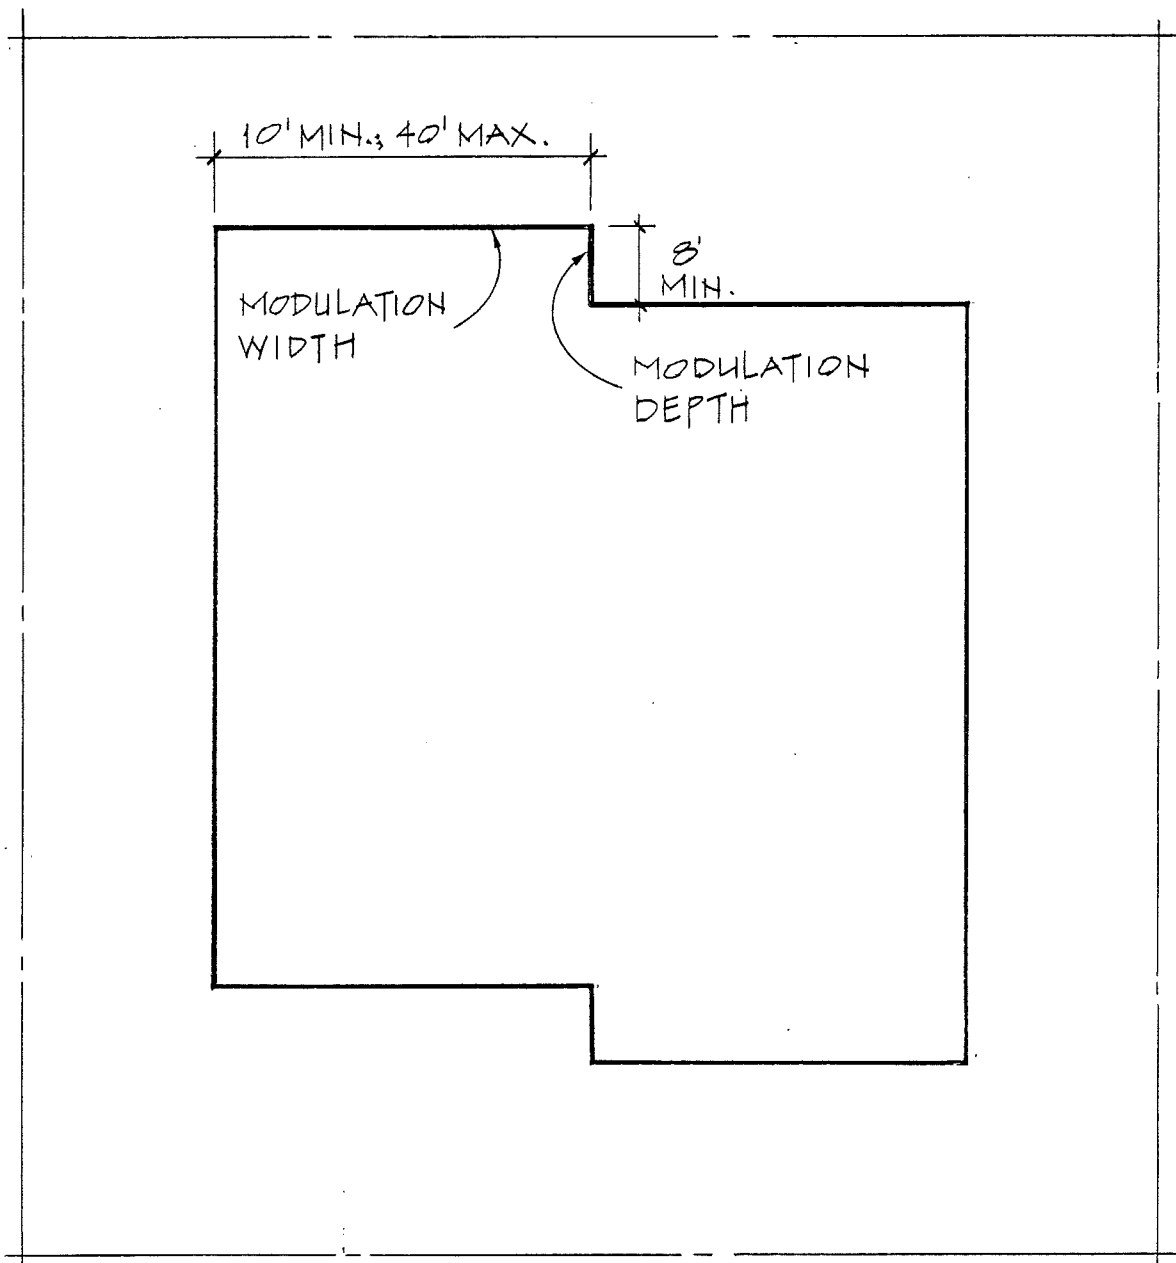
MIDRISE, REQUIRED WIDTH
